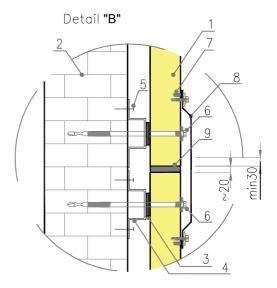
S Panel PIR; MWF; EPS - sandwich panels - assembly to wall (masonry of rainf. concrete)
